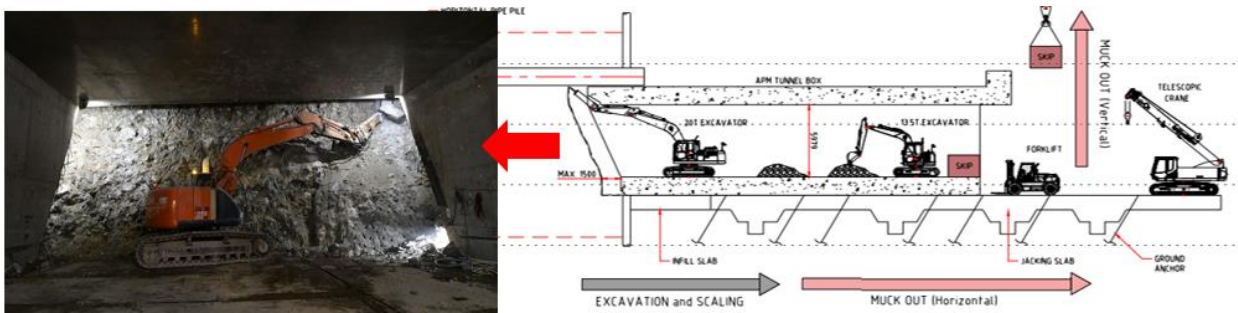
Excavation with the use of hydraulic excavator and breaker.
